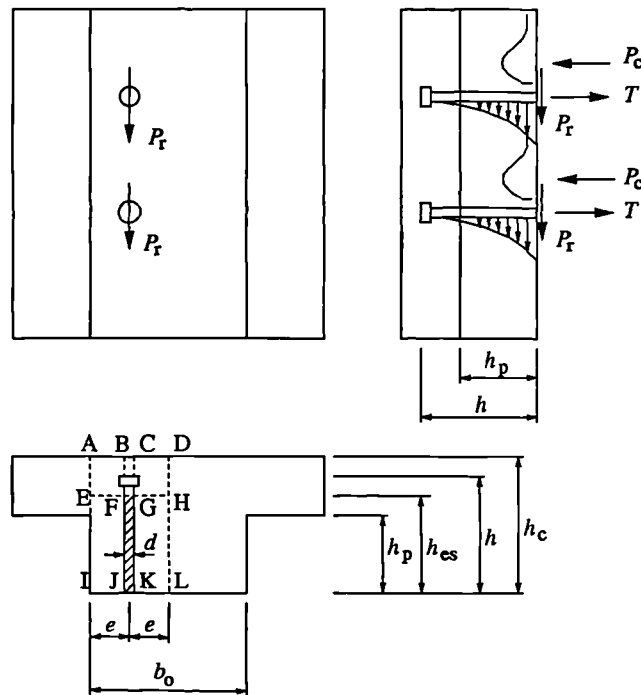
Patch load from the stud connector (parallel sheeting).
